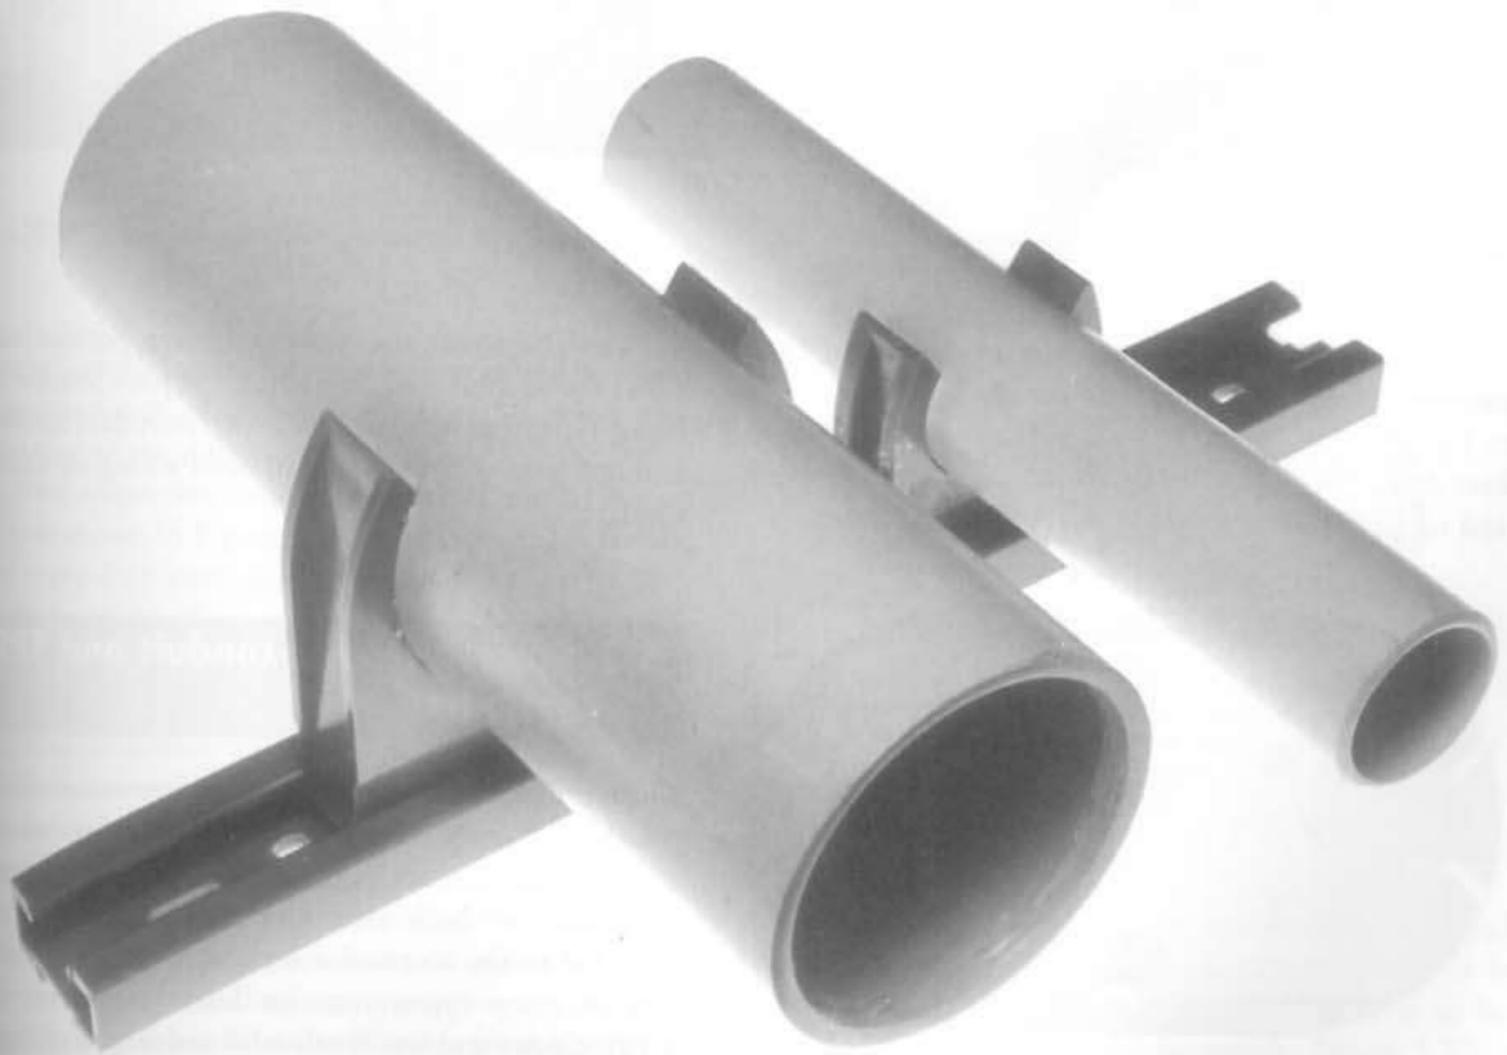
Fastening system for multiple runs of conduit GERARD INDUSTRIES
